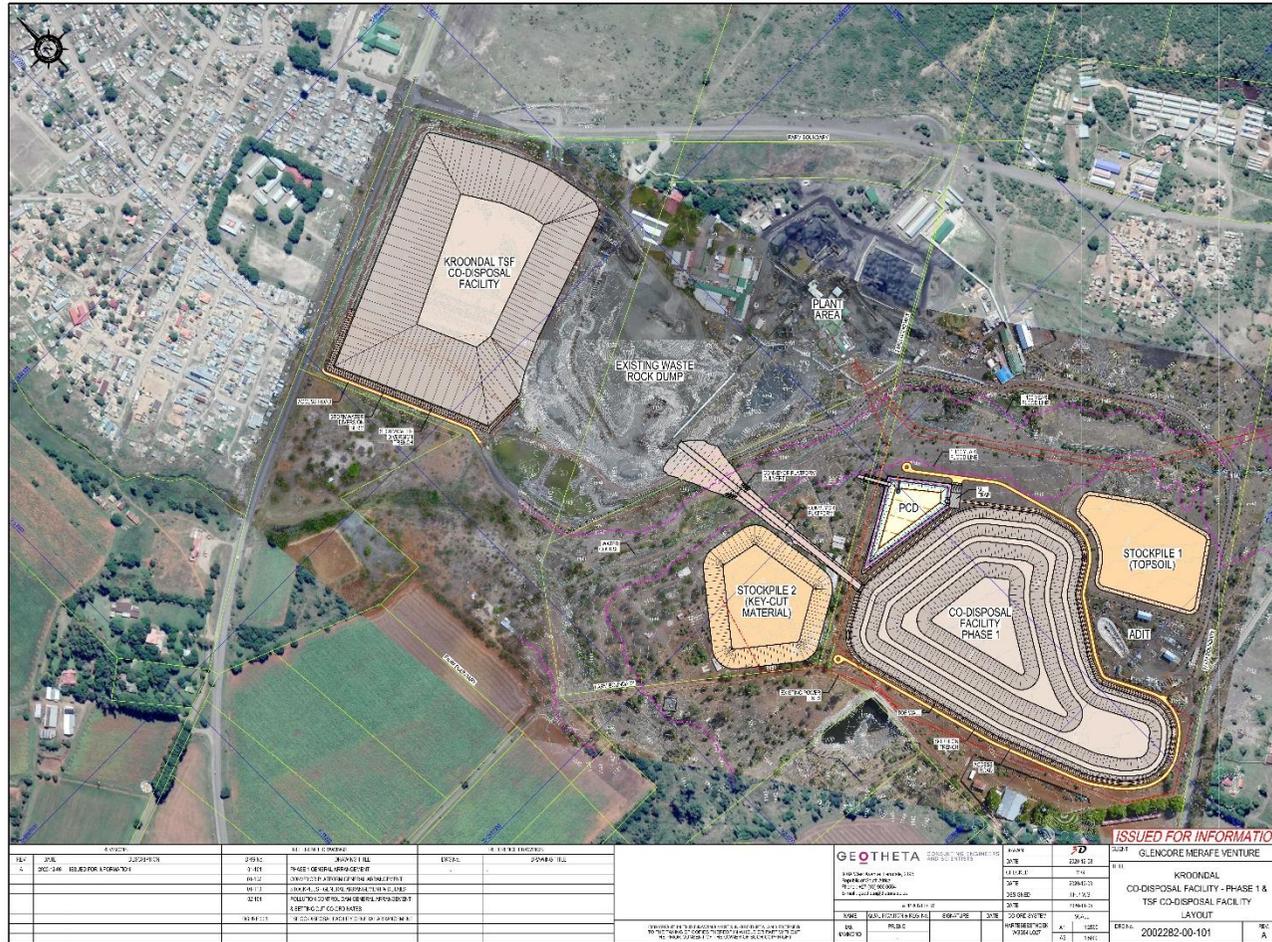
Design plan detailing infrastructure components proposed for the proposed Glencore Kroondal Mine Residue Expansion Project.
